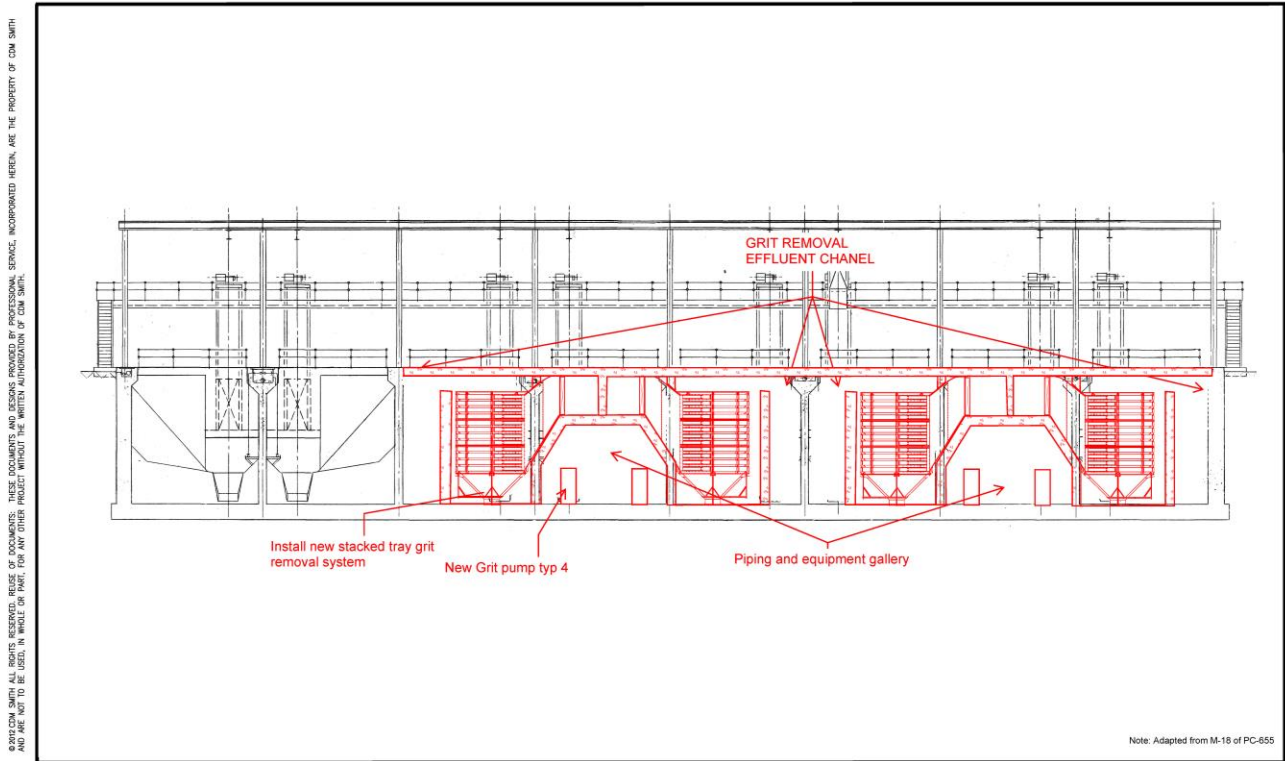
Section View of Stacked Tray Grit Removal in Existing Grit Tanks
